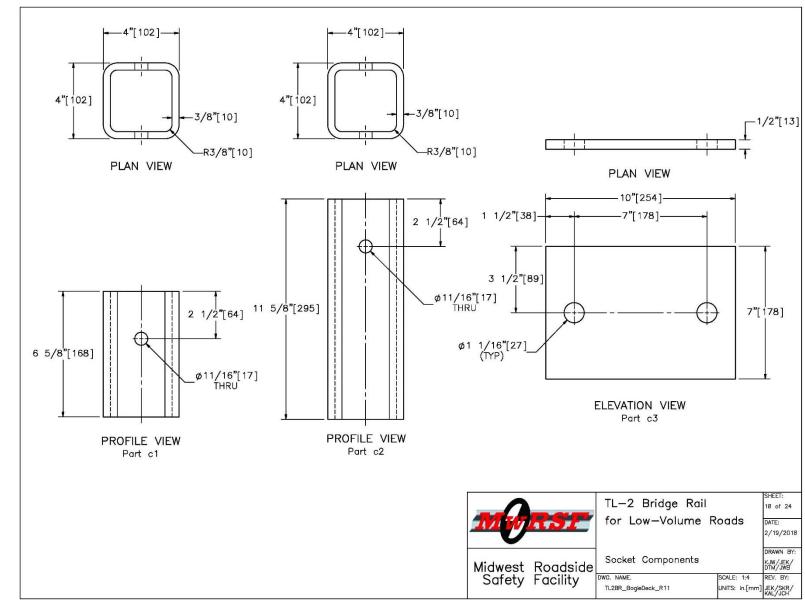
Bogie Testing Matrix and Setup, Socket Components
